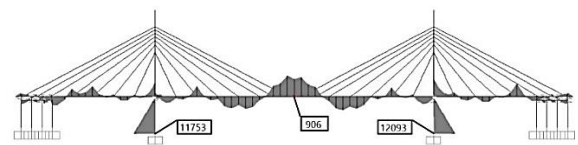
Bending moment of girders and bridge pylons under initial cable tension and dead loads in model 2 (ton.m).
